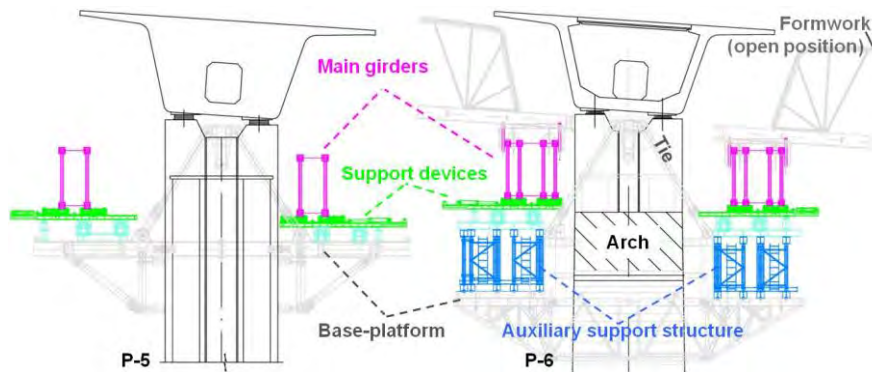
Cross section at pier P-5 (left) and P-6 (right)
